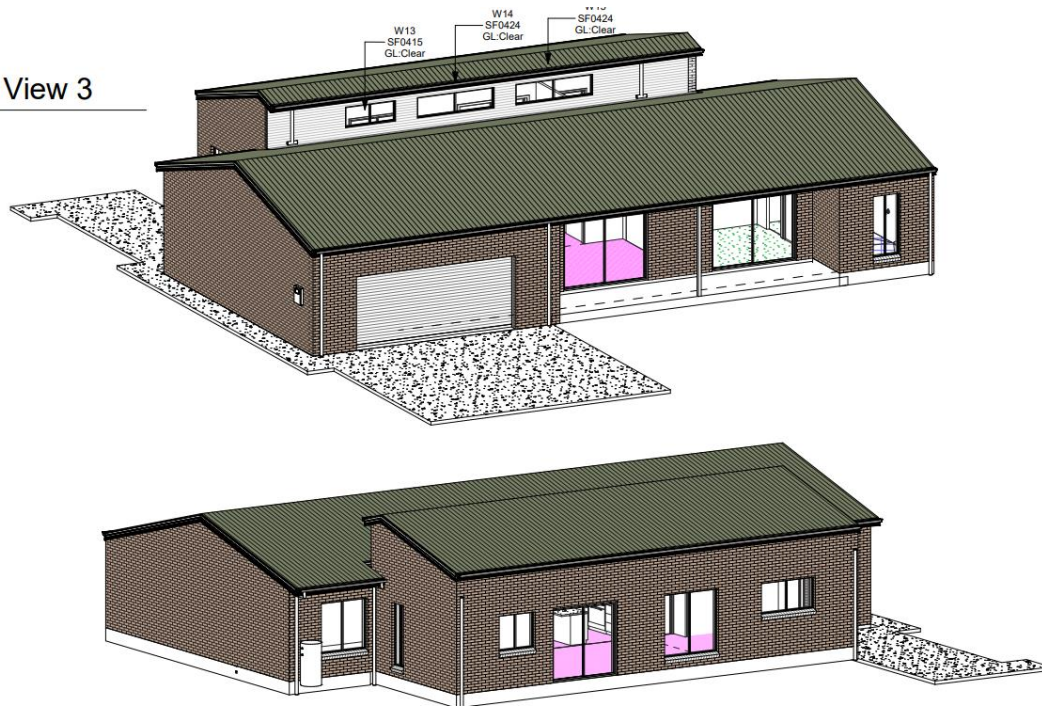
3D View of Proposed Alterations and Additions (Front elevation at the top/ rear elevation at the bottom)
